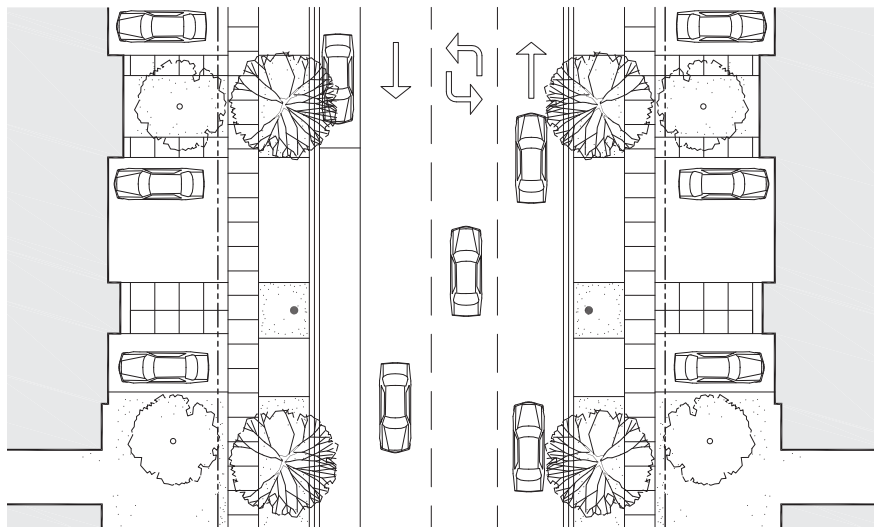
Avenue / Transit Corridor - 22.0m R.O.W. / 2 travel lanes / on-street parking on one side / 4.55m boulevard
